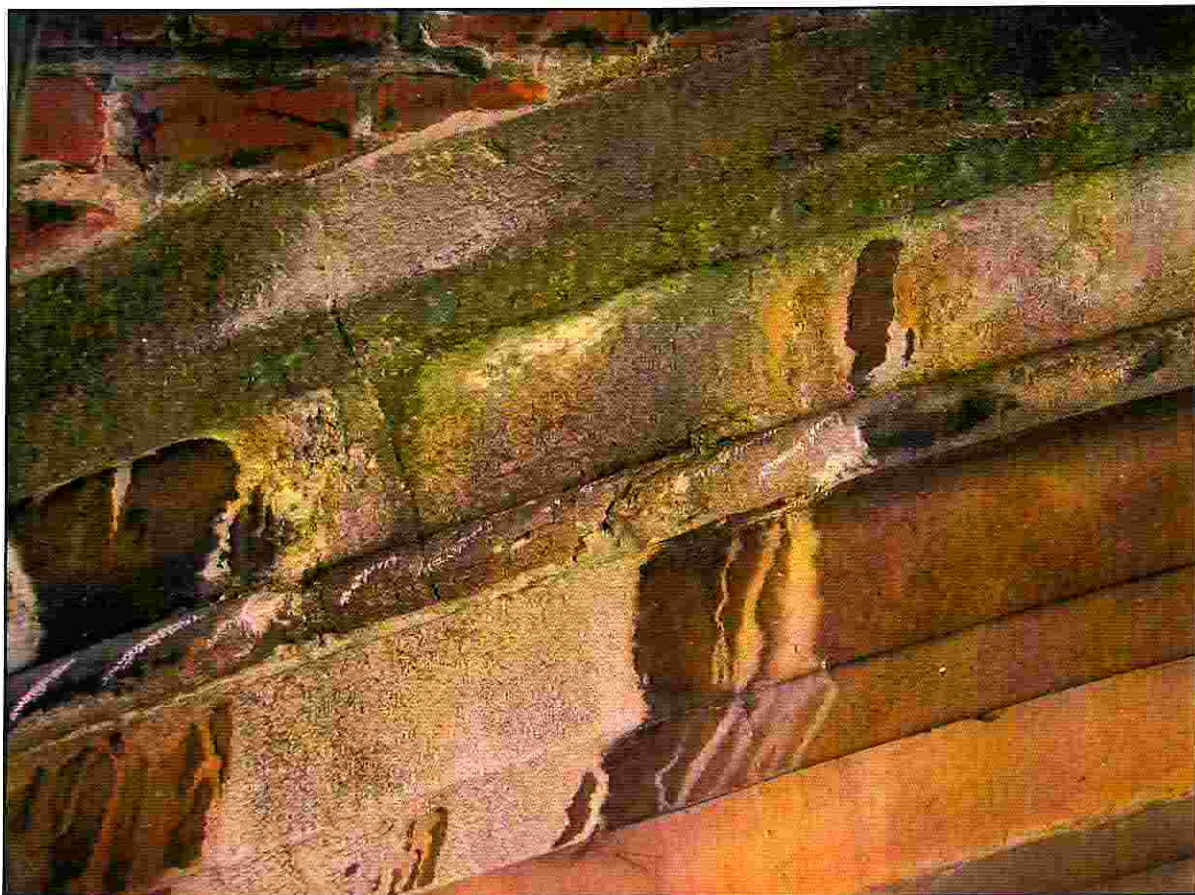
Chapel Court, North Facing Elevation - Window stonework before replacement
